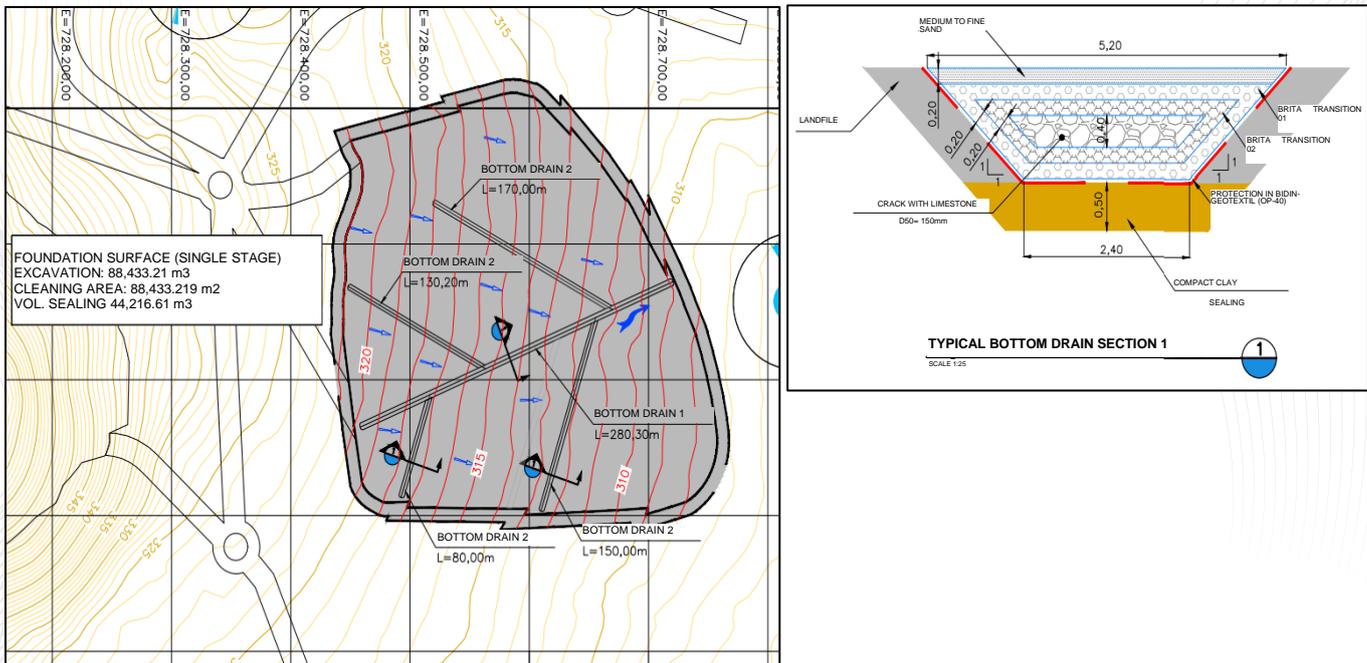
Plant deep drainage Low Grade Ore stockpile - PMBT (GHT, 2022)
